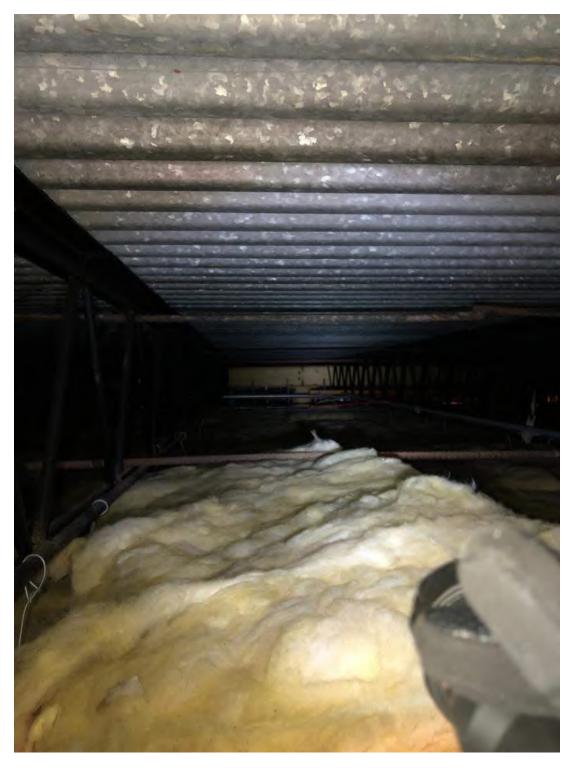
ROOF AND JOISTS OVER APPARTUS BAY
